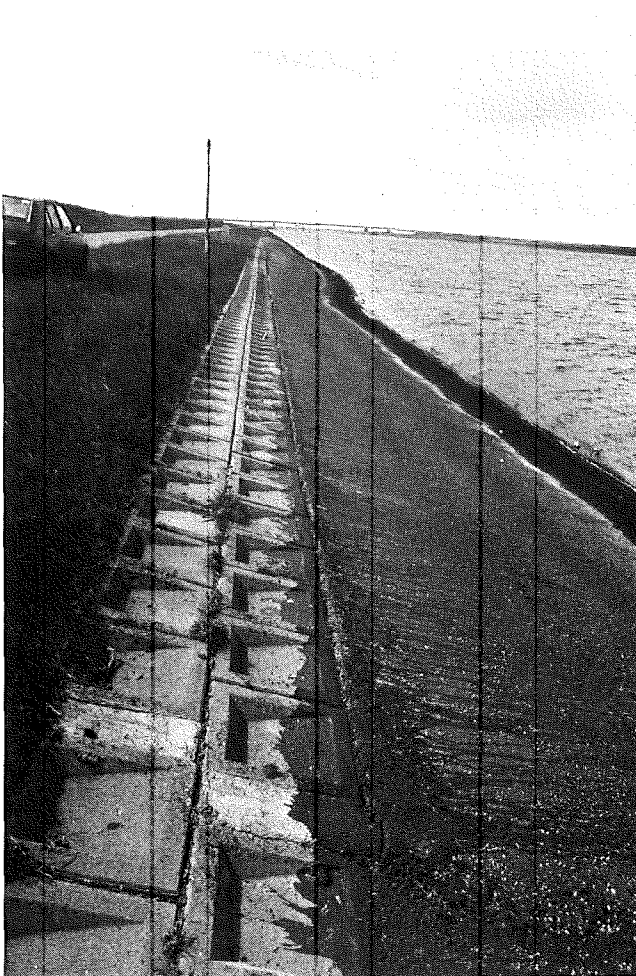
Deformation of an asphaltic concrete revetment caused by irregular settlement of the dike body
